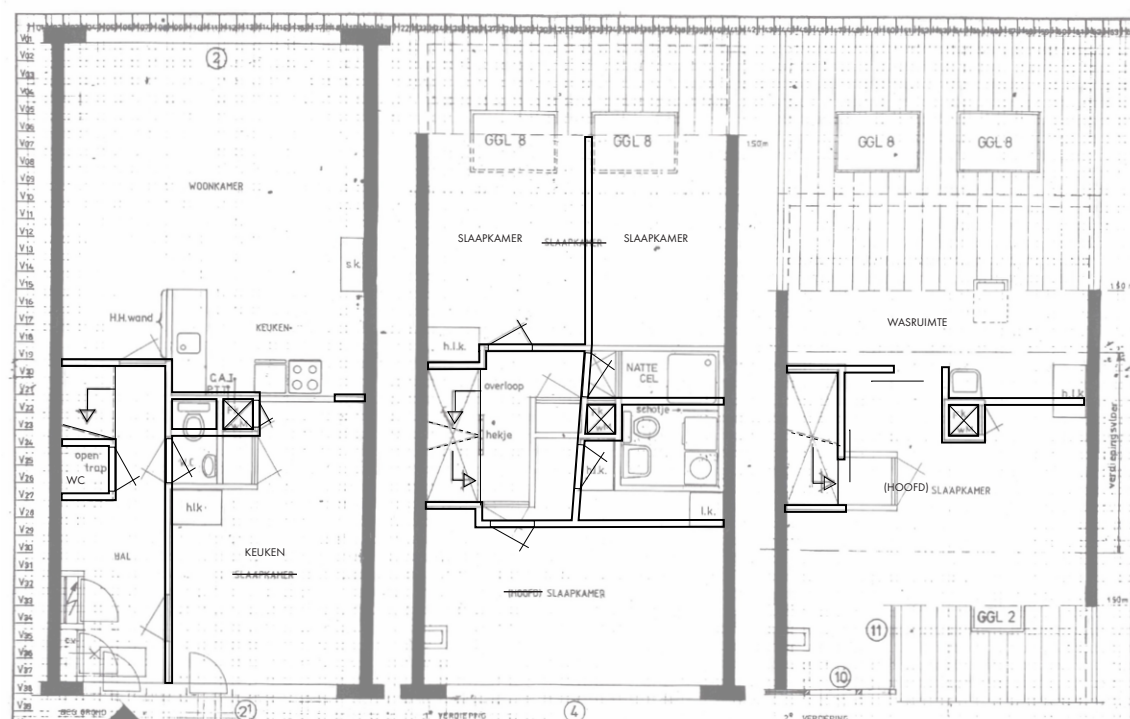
Sketch current dwelling plan Household 2. From: Collection Het Utrecht Archives, by Bruynzeel, 1982. Adapted by the author, 2023.
